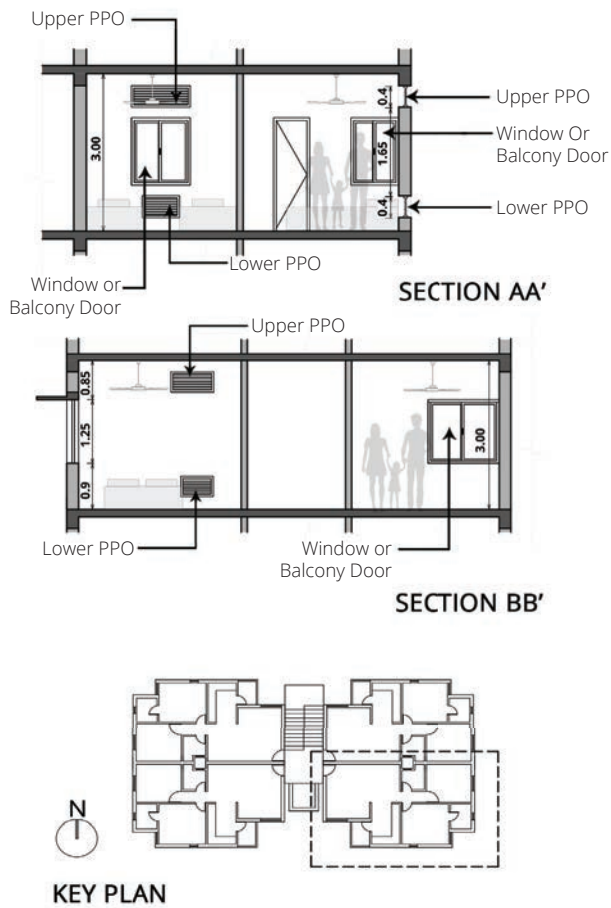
Case study apartment 2HBK Case-1 (Source: Rawal & Shukla, 2014): the floor plan with suggested layout (Fig. 15a), cross-section A-A (Fig. 15b) showing the horizontal sliding (sash) windows and louvres of the auxiliary PPOs for ventilation.
